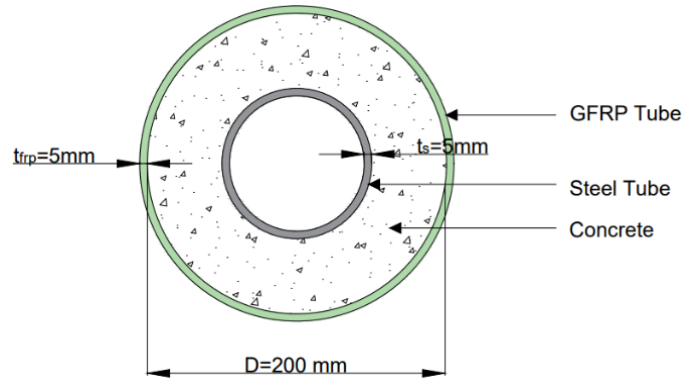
Typical cross-sectional dimensions of tested DSTC specimens.
